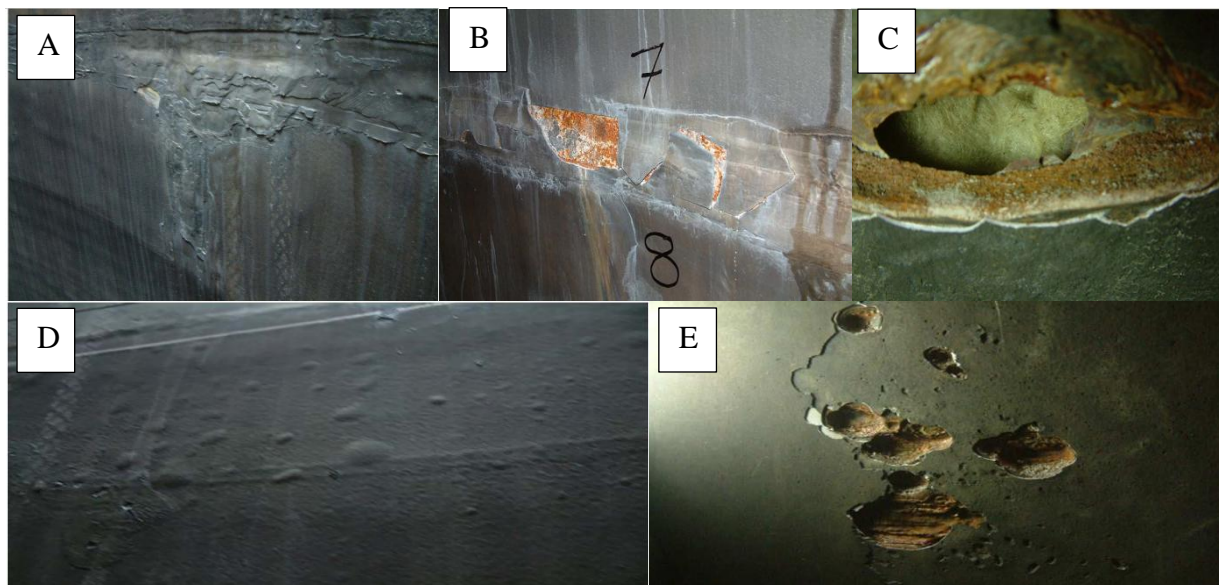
(A) Coating protection at the connection of the two stack segments, (B) Disbonding of the protective coating on the stack walls, (C) Perforation of the internal stack wall, (D) Blistering of the coating on the stack duct walls, (E) Damage to the stack lining
